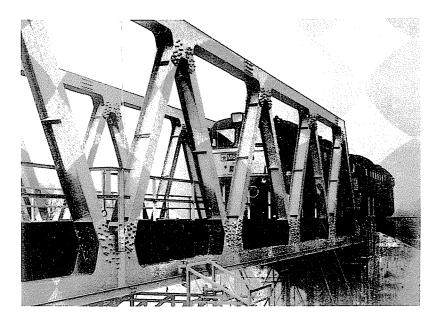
Main girder of the bridge at Tunyogmatolcs, and the locomotives used for the load test.
